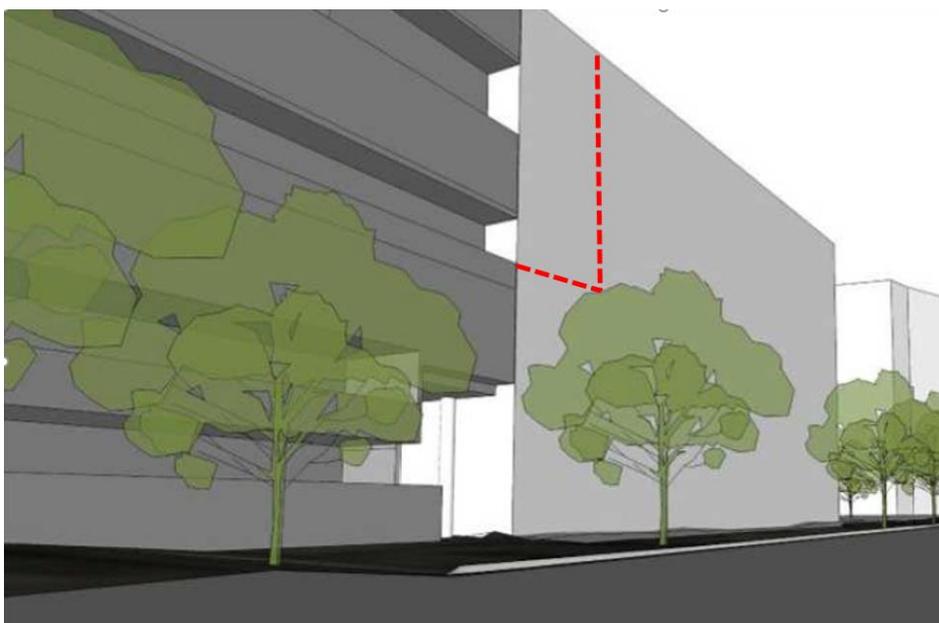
Indicative line to show building envelope setback 3m to avoid windows and balconies
